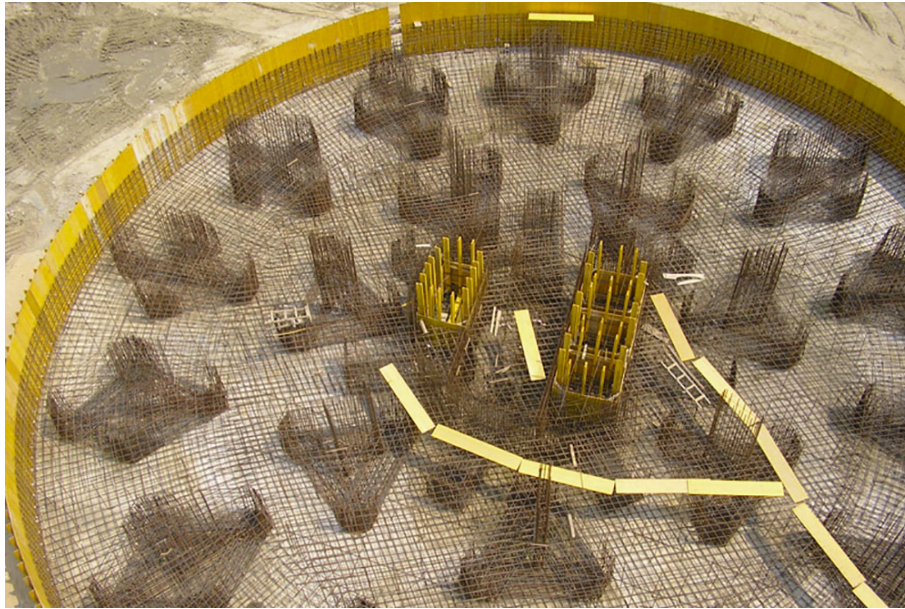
THREE STAR HOTEL PILE FOUNDATION FOOTING – YENAGOA
